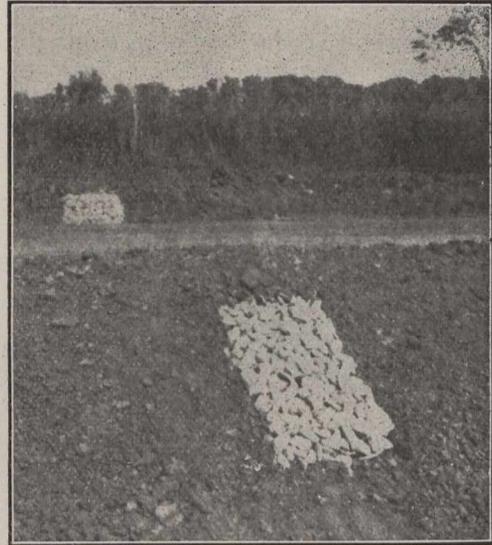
Shoulder Drain Provided for Outlet for Under Drainage.
